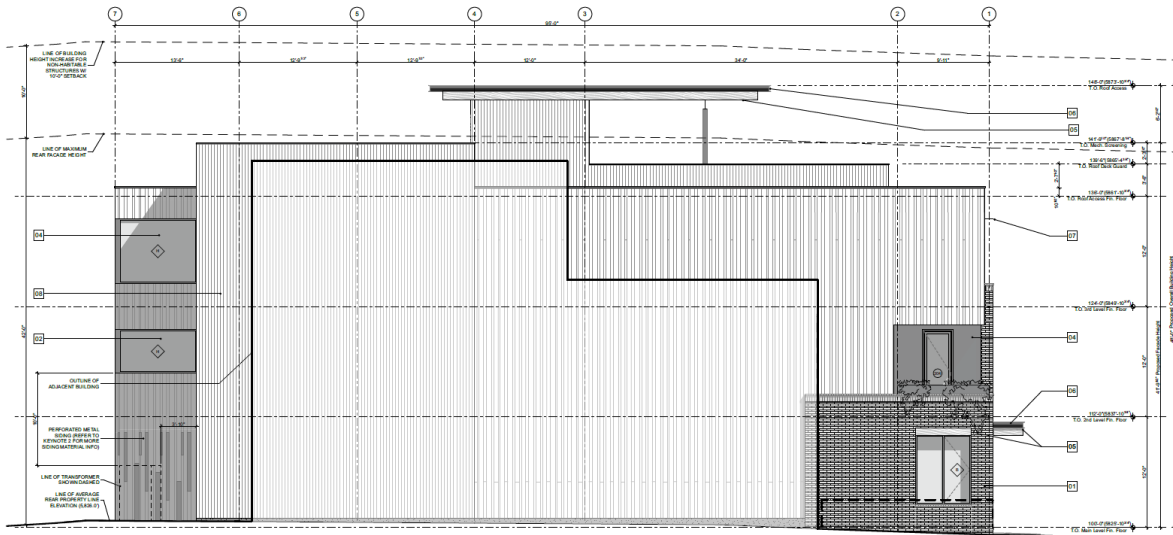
Interior Side Wall Elevation (Project Plans Sheet A302)
